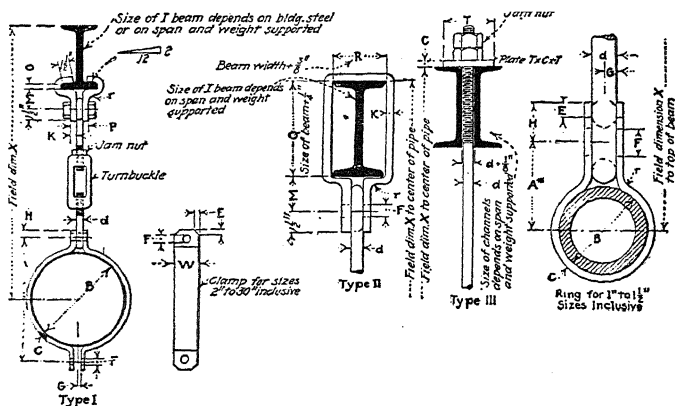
Details of rod hanger, designed for 12-ft spacing.
